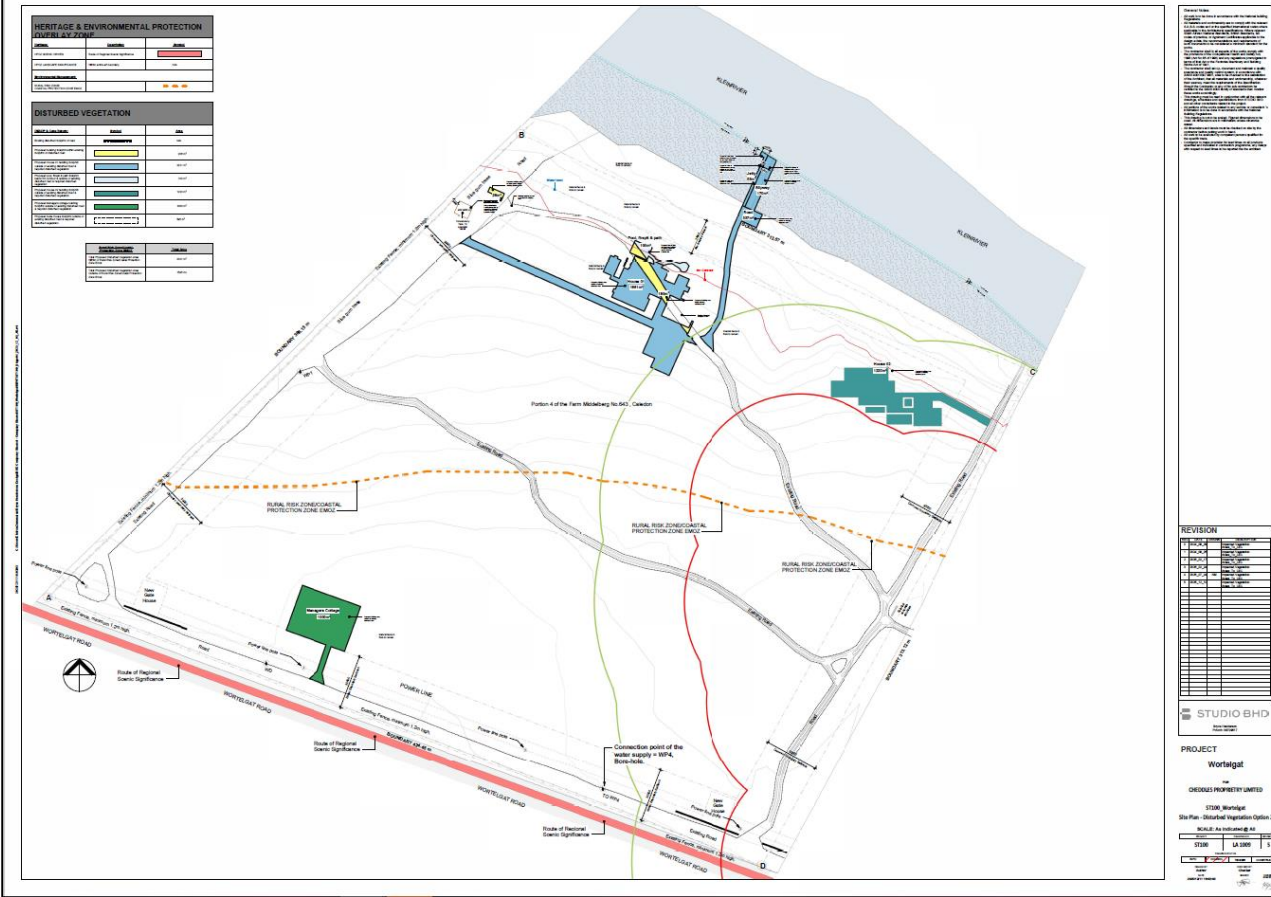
Proposed Site development plan – Preferred Alternative (Alternative 3).
